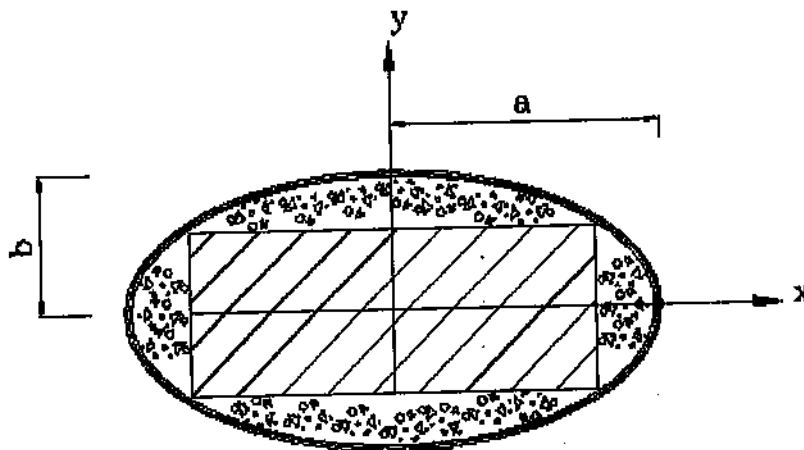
Elliptical jacket retrofit for rectangular columns
